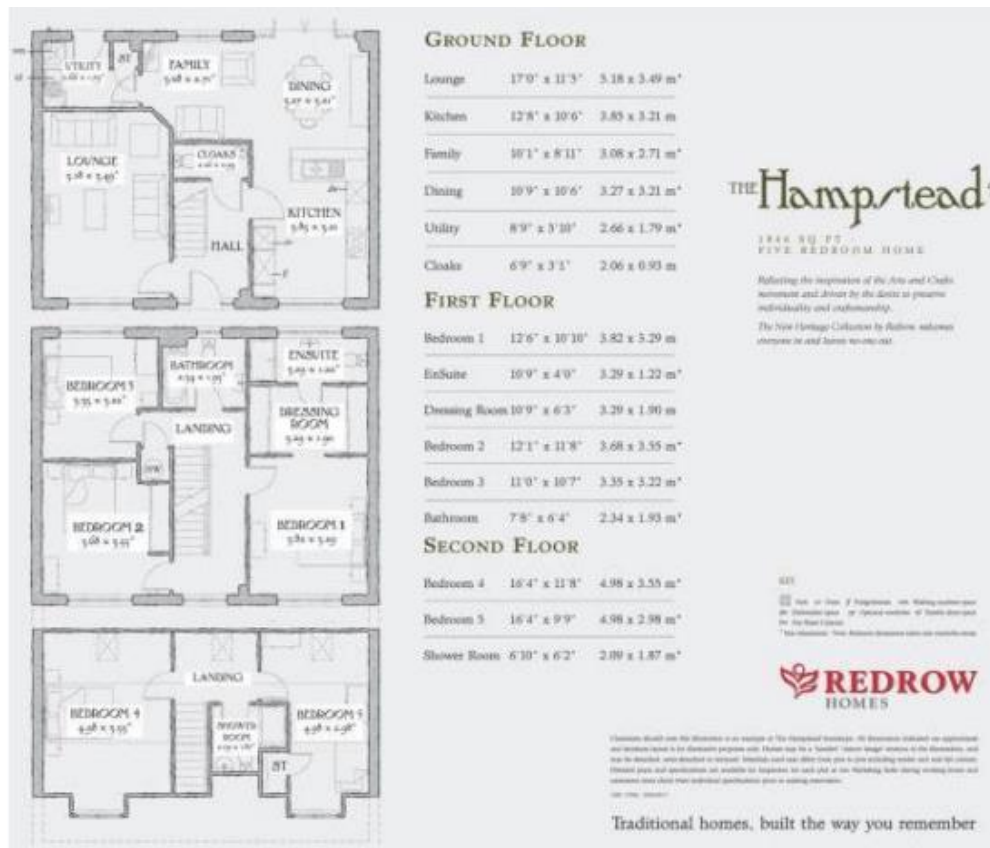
House type by Redrow Floor plans (Burgess et al, 2019, p24)
